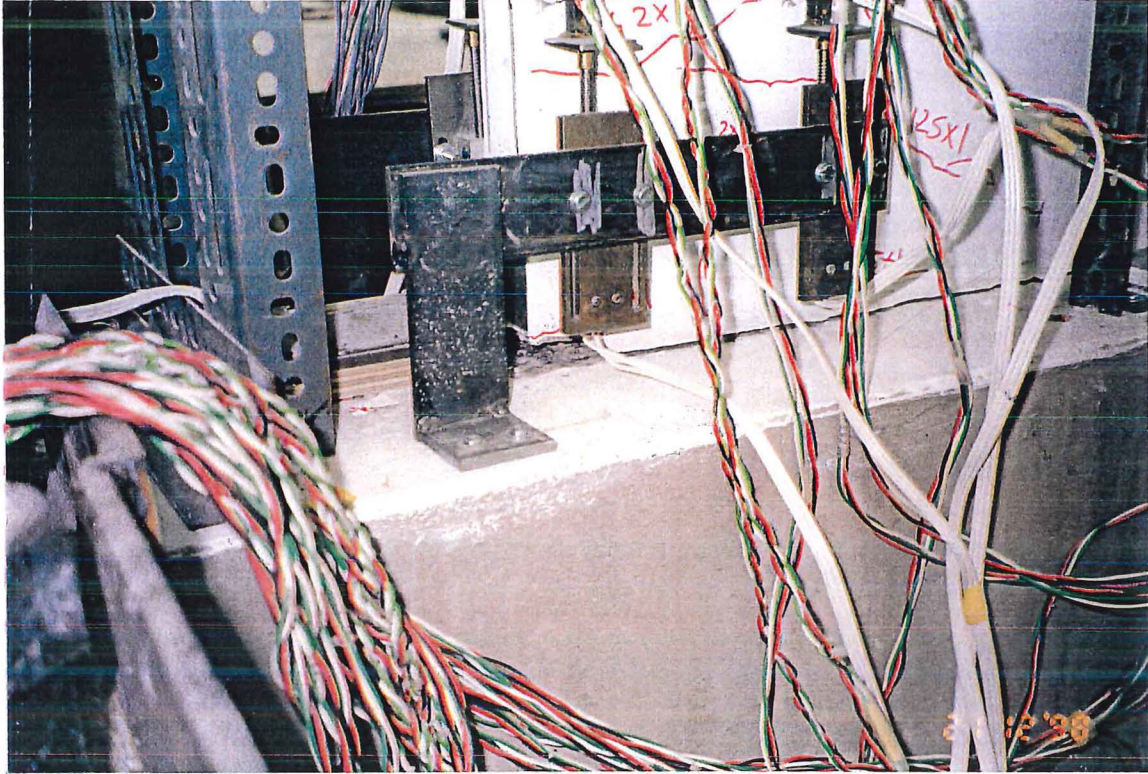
Unit 2: Crushing and spalling of compression concrete at $\mu_d = +2.5 \times 1$
